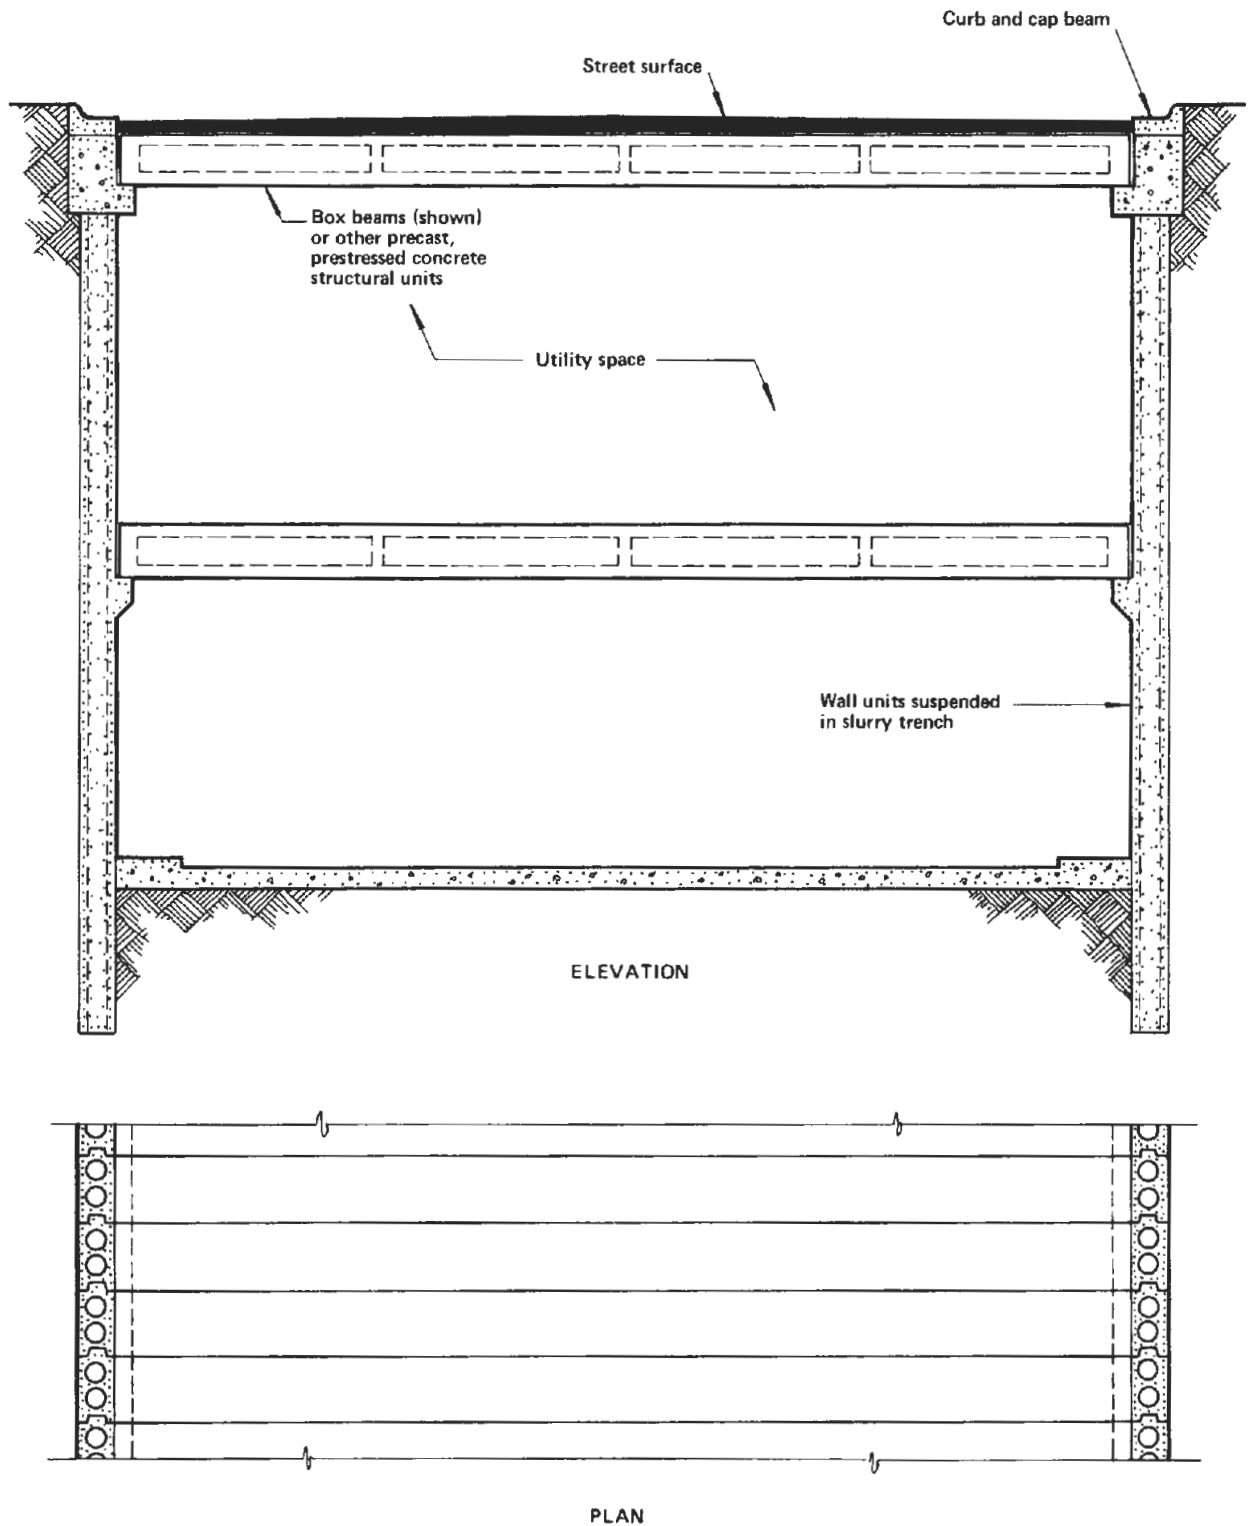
Schematic of system using space above tunnel roof as utility corridor.
